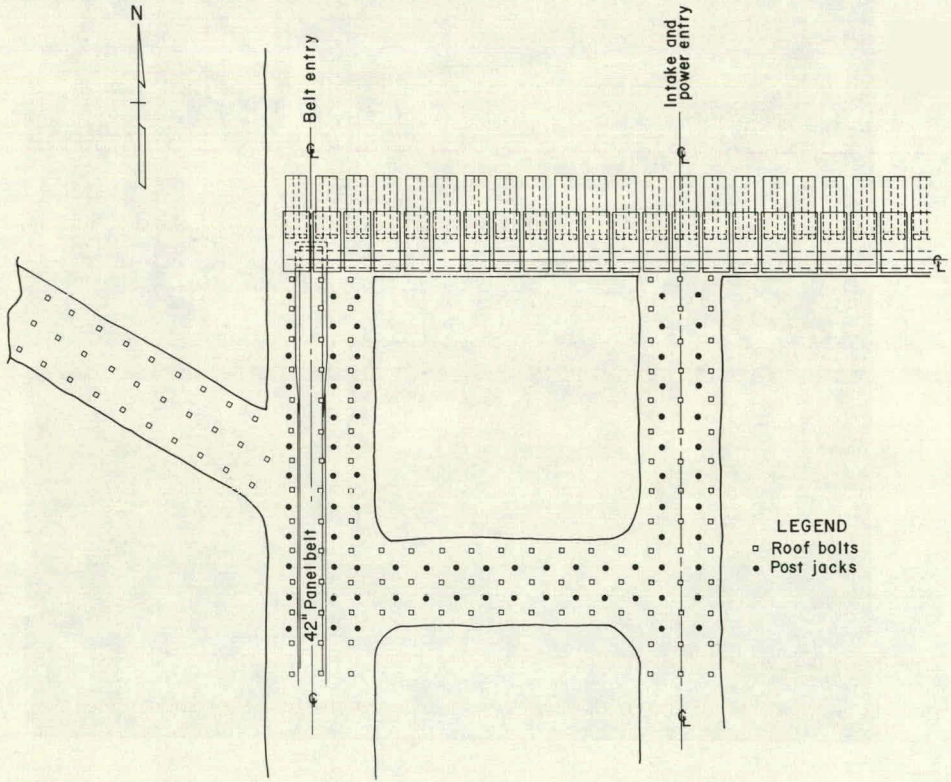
Roof Support Plan for Headgate and Supply Gate
